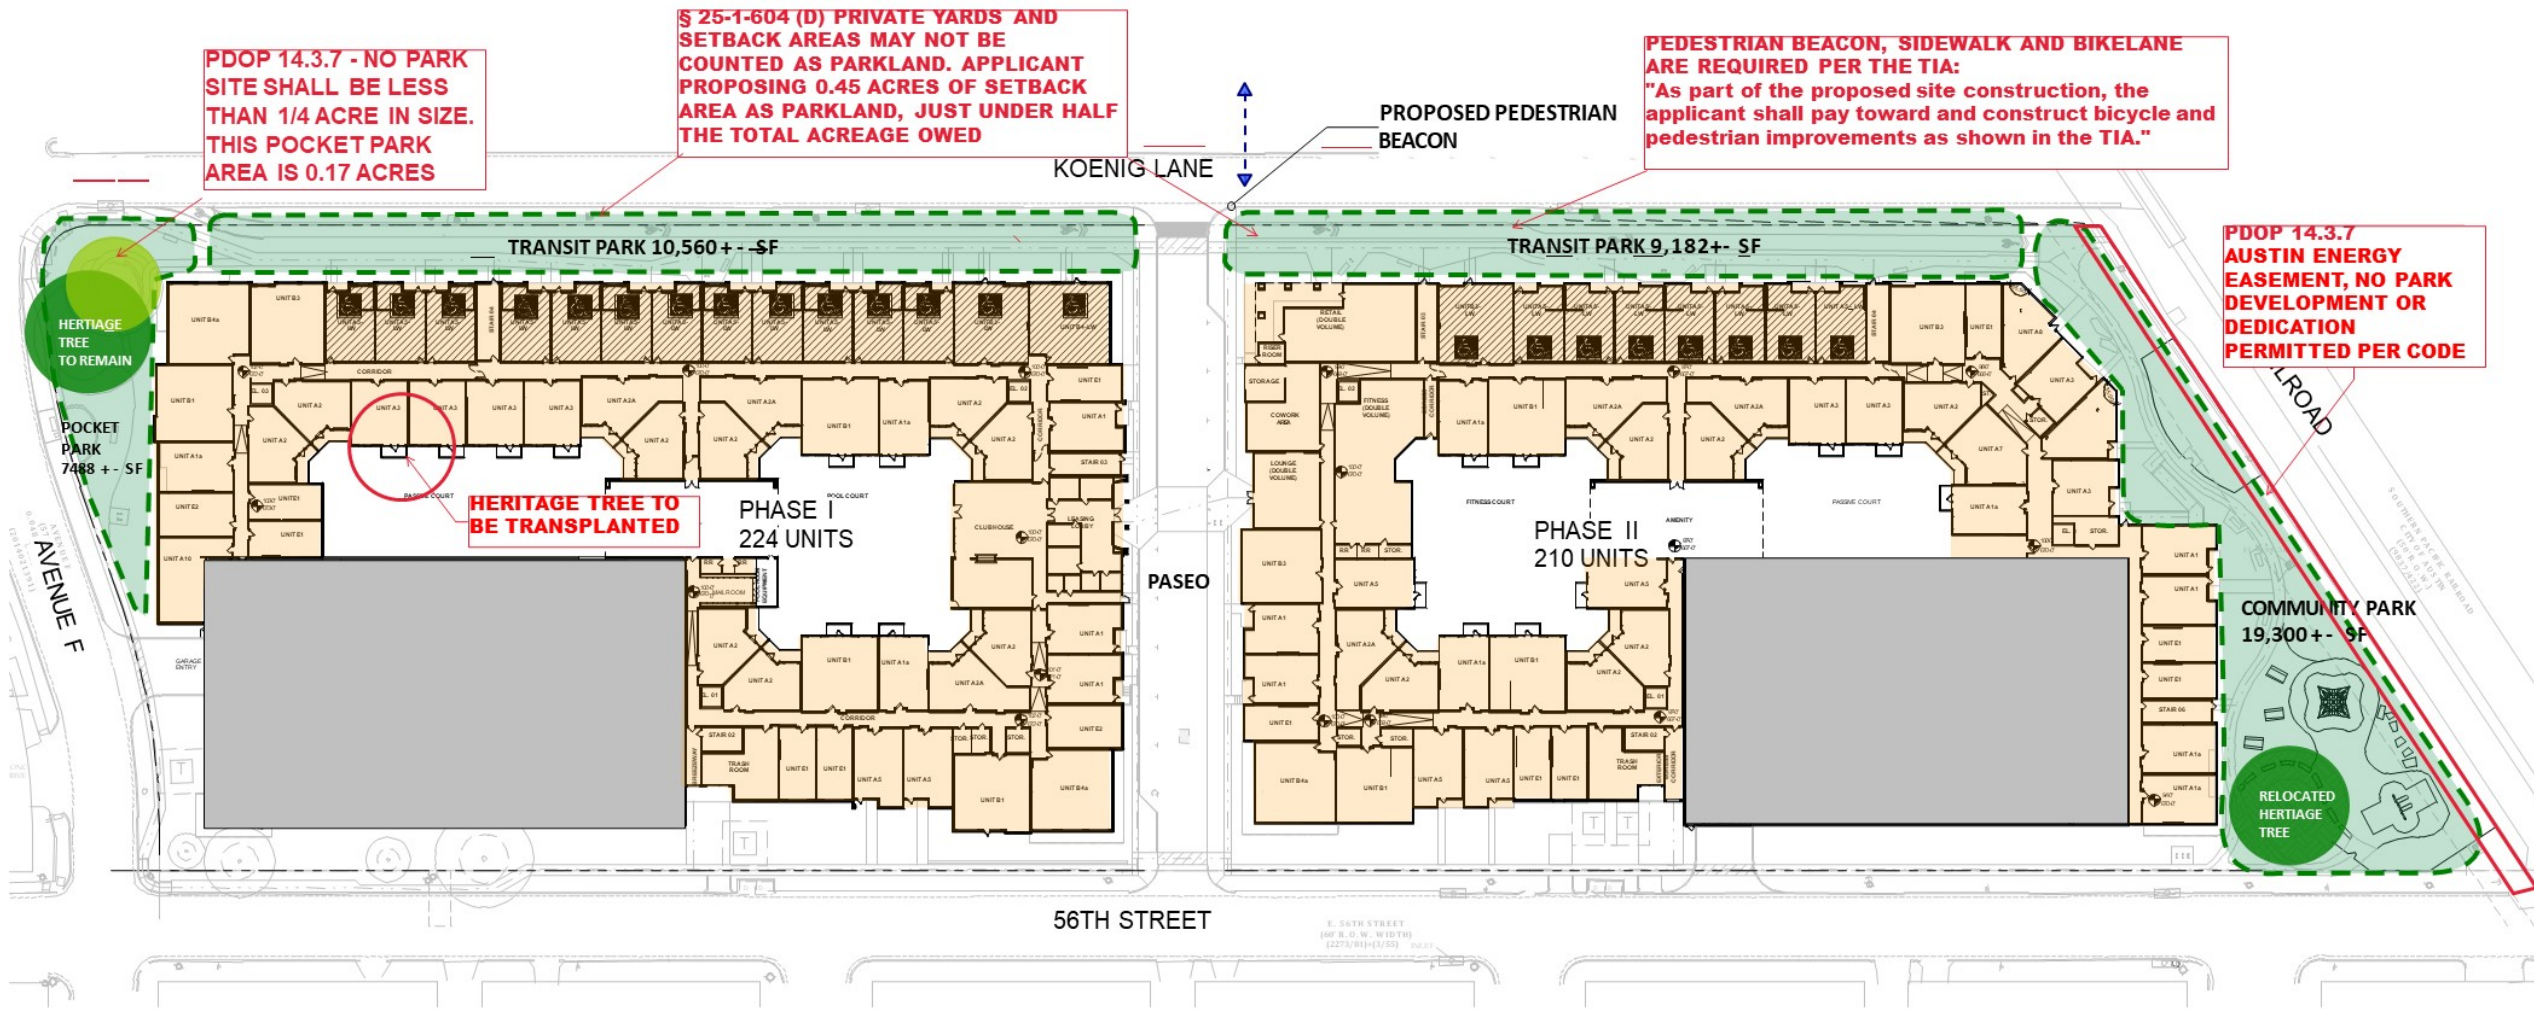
FIGURE A - CURRENT PROPOSED SITE PLAN / PARK PLAN
